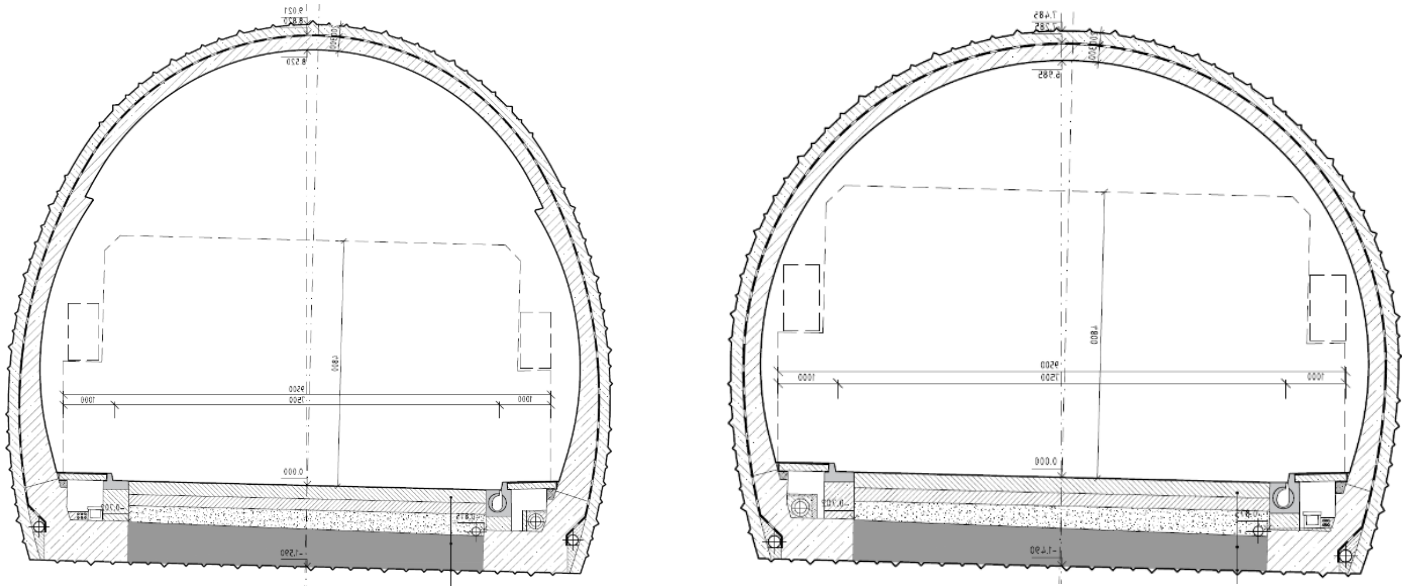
Typical cross-section of a tunnel, left with preparation for intermediate ceiling, right without intermediate ceiling
